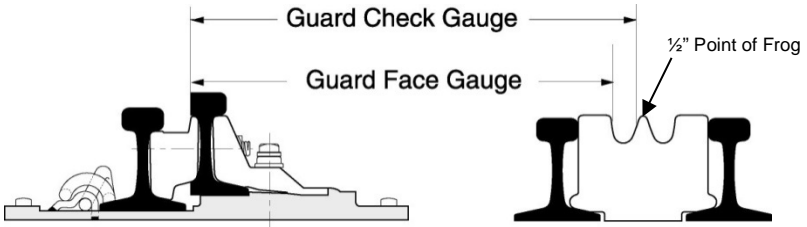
Guard Check Gauge and Guard Face Gauge Measurement locations.
